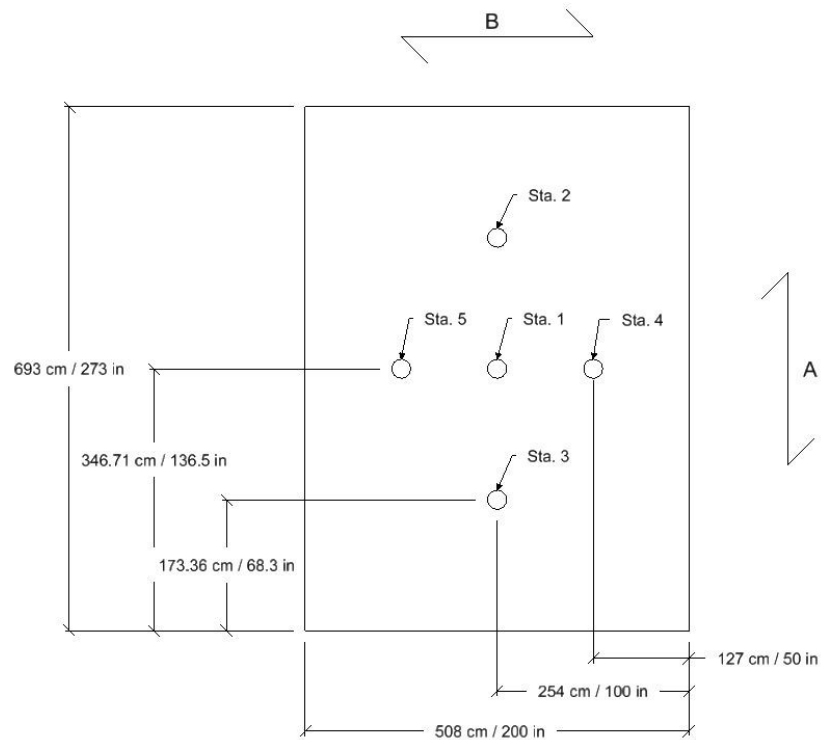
Instrumentation plan for accelerometers in the longitudinal (A) direction and transverse (B) direction
